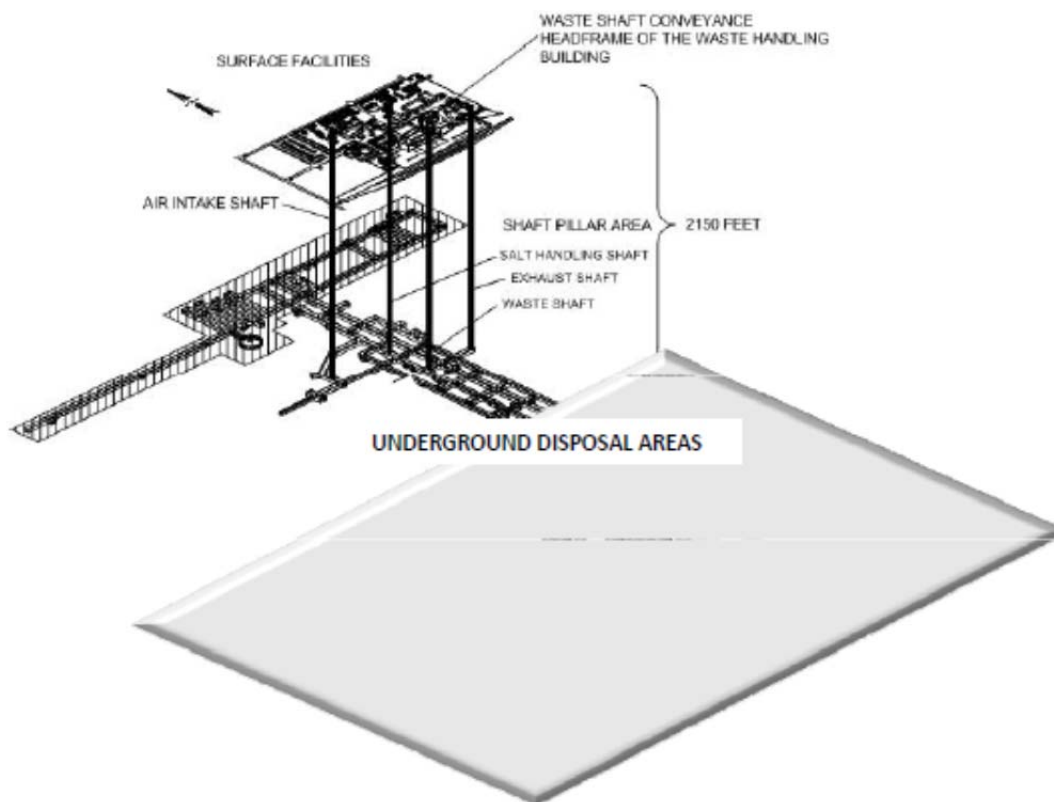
General Layout Of The WIPP Facility Relative To The Underground
